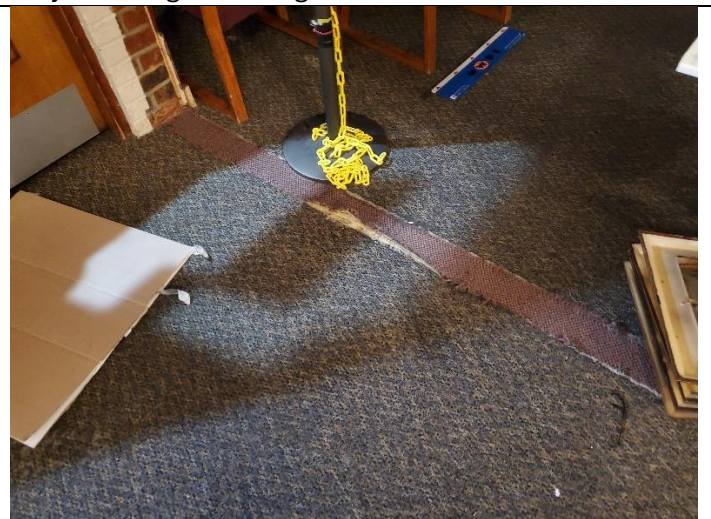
Samples 129 and 130 Asbestos-Containing Black Mastic Under Dining Room Carpet
